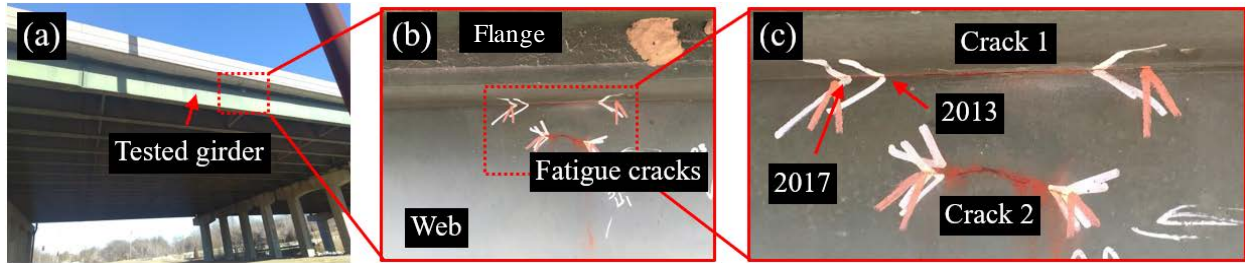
Detail Views about the Exterior Side of the Girder Prior to the Sensor Installation
